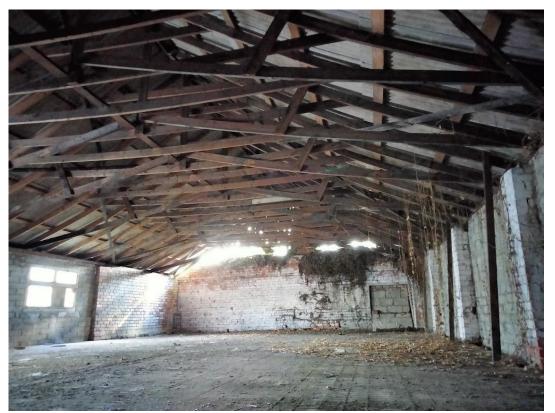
First floor of Back Building. Survey of this space was not possible due to floor in dangerous condition with wall plate supporting the floor coming away from wall bulging outwards (on right/back wall). While no bat roost features were discerned from a vantage point in the north-west corner (as per photo) the building is open at the southern end and there is potential for night roosting/perching in the roof timbers. Bats were not observed emerging from the Back Building during surveys.
